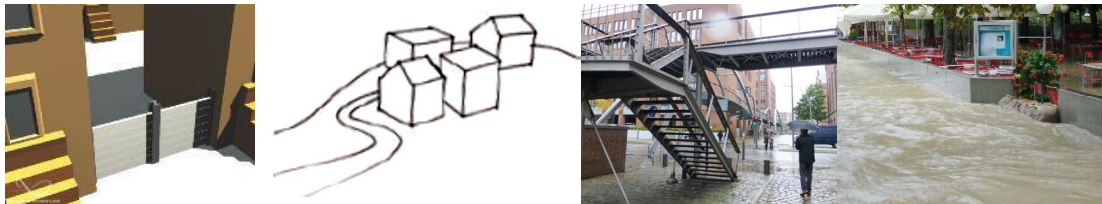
, Measures applied at building blocks level (Van de Ven et al. (2009) & Pötz et al. (2014))
